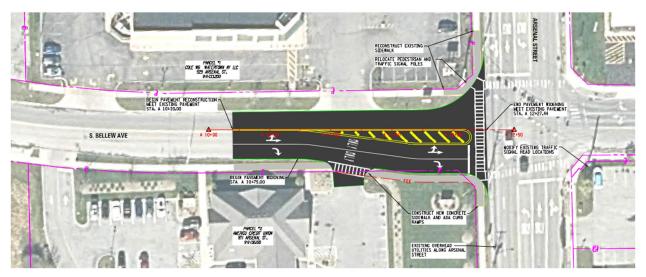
Alternative 1 – Bellew Avenue South & Arsenal Street Intersection Improvements
